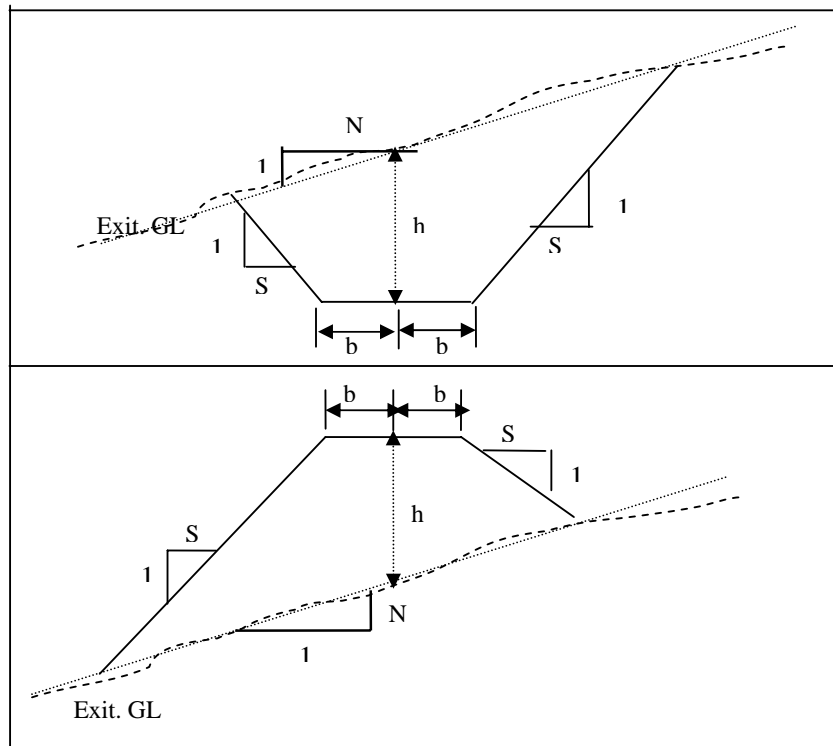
Typical section of road cross-section for irregular cutting terrain surface
